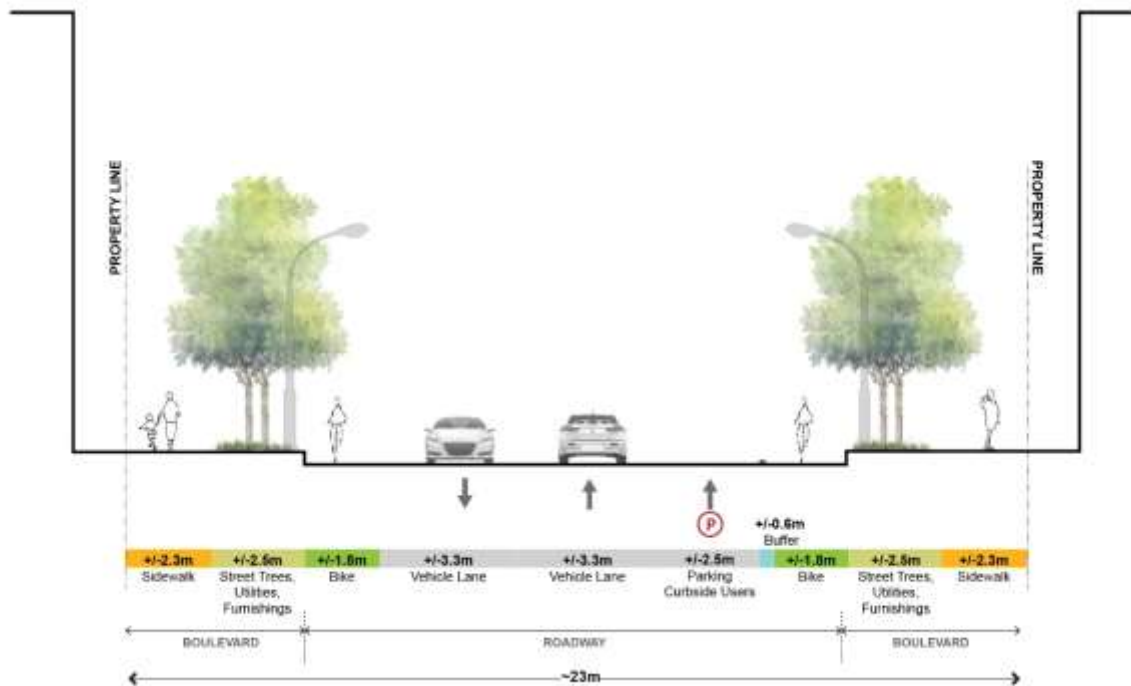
Minor Collector Road Typical Cross-section, 23 metre ROW
